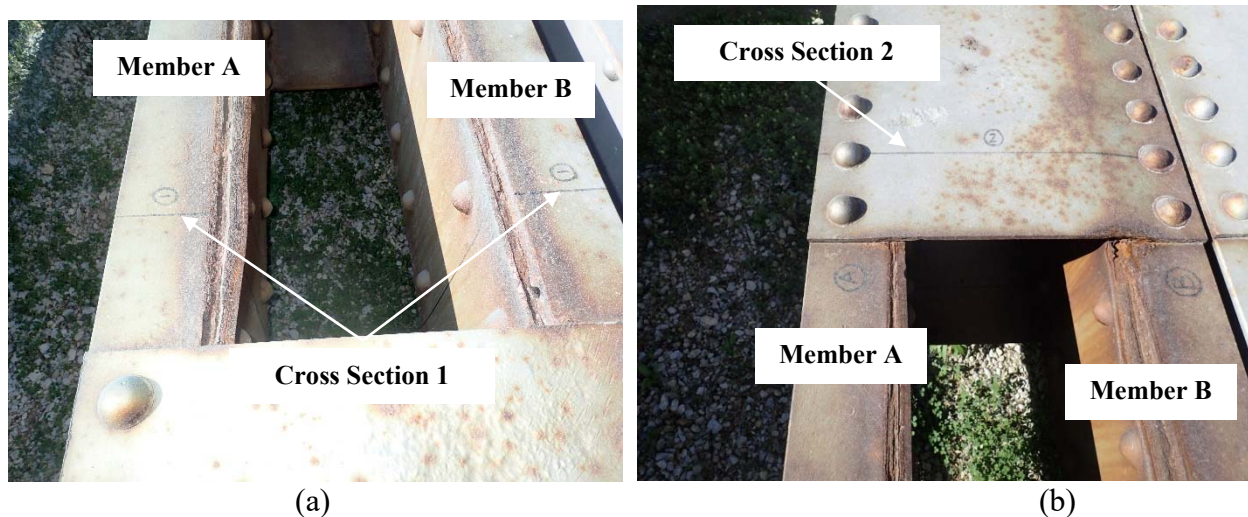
Truss chord at (a) Cross Section 1 and (b) Cross Section 2
